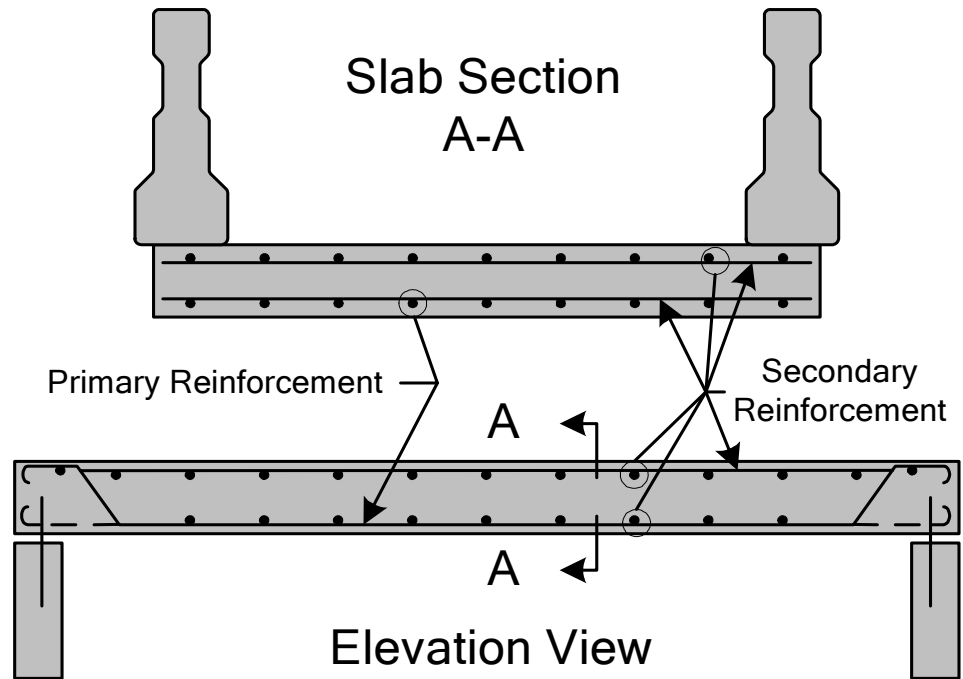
Steel Reinforcement in a Simply Supported Concrete Slab
